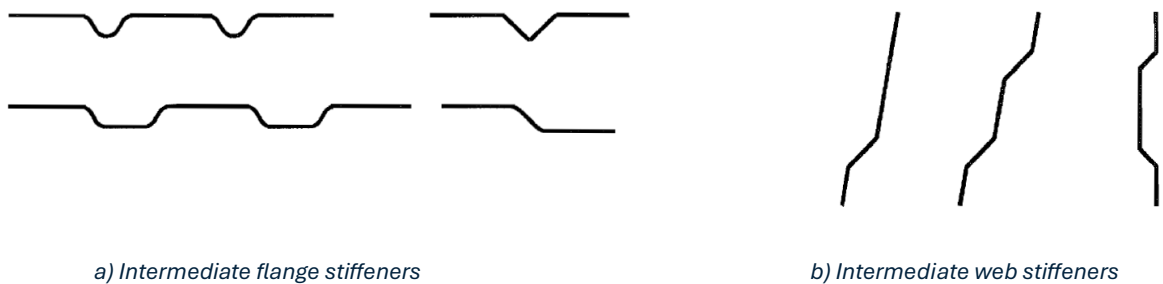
Typical intermediate longitudinal stiffeners [8].
